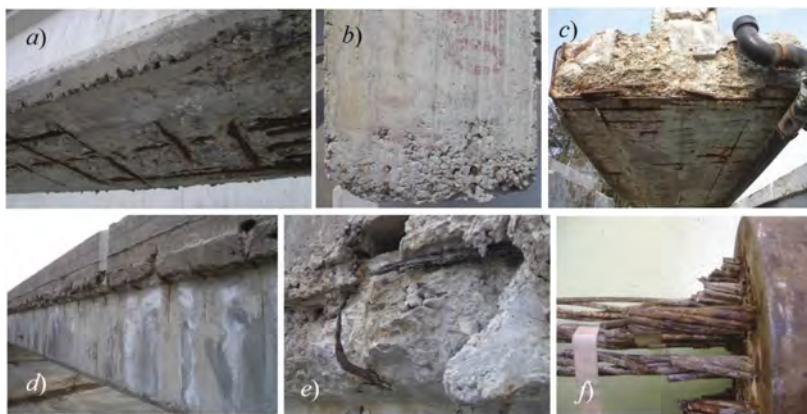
Effects of steel corrosion and concrete degradation: (a) cracking and spalling or delamination; (b) concrete segregation; (c) degradation of structural parts exposed to wetting; (d) efflorescence; (e) pitting corrosion; (f) corrosion of steel strands at the anchor head.
